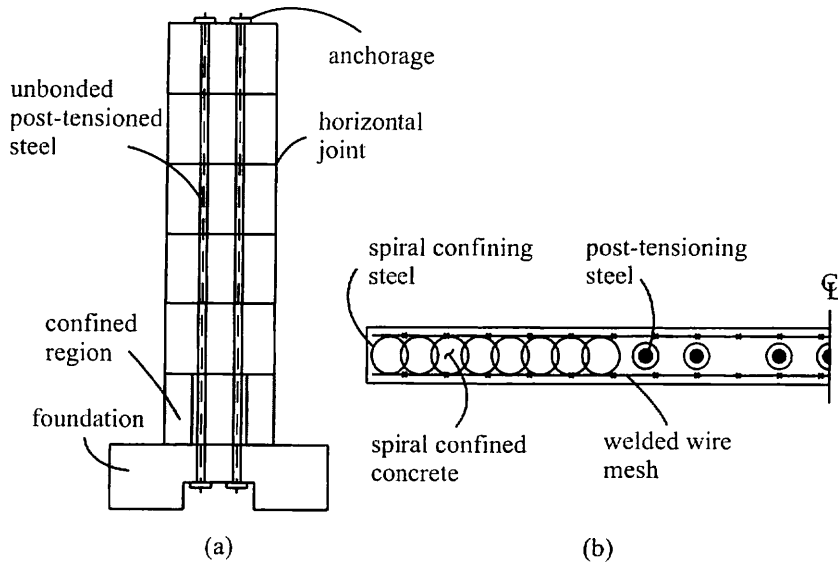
Unbonded post-tensioned wall: (a) elevation view; (b) half of cross-section of base panel.
